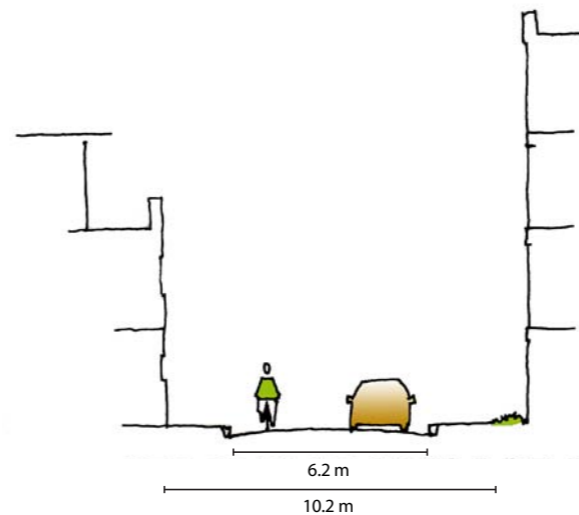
Section through a tertiary street (predominantly residential) with provision for on-street parking
